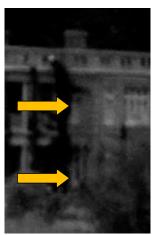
1923-1928 extract image with subject windows in-situ arrowed.
